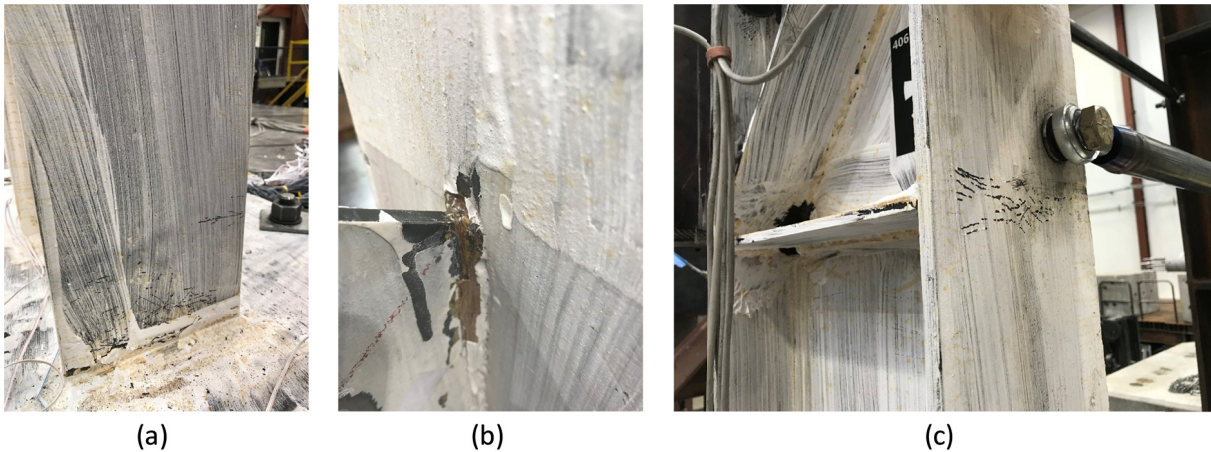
(a) Column deformation at base; (b) bottom gusset-to-column edge weld crack; and (c) yielding evidence at the link-to-column connection location.
